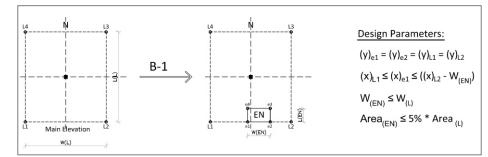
Stage (B): Rules for generating the entry hall (EN) on the ground floor
